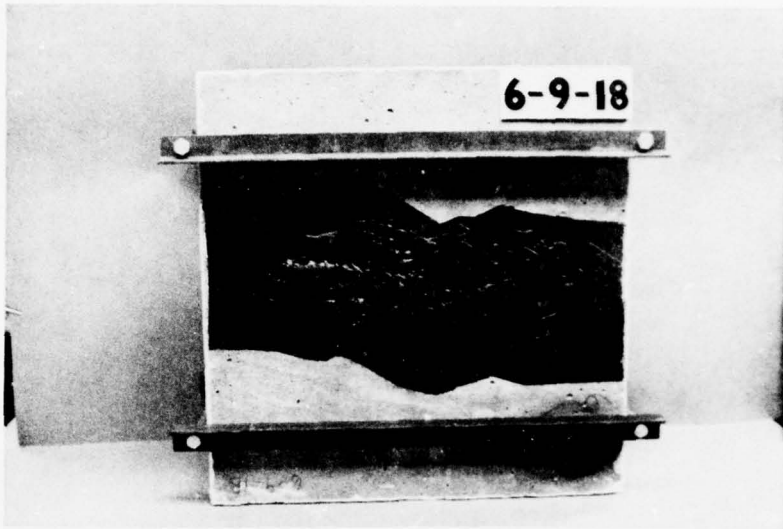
Tremco 50V and primer sprayed in 5/16-in. (7.94-mm) crack (specimen 6).
